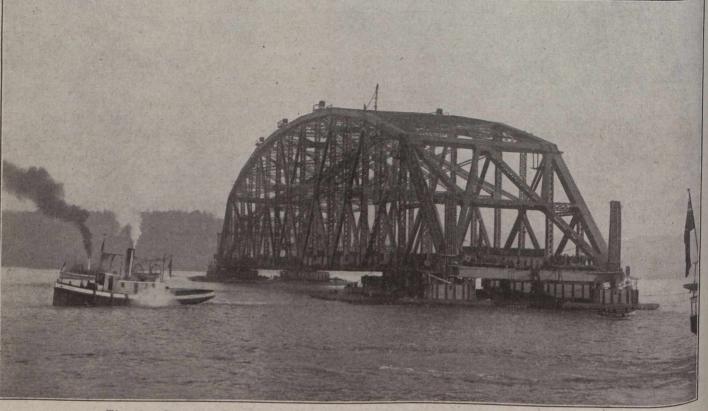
Showing Suspended Span, Mounted on Scows, Being Towed to Bridge.
